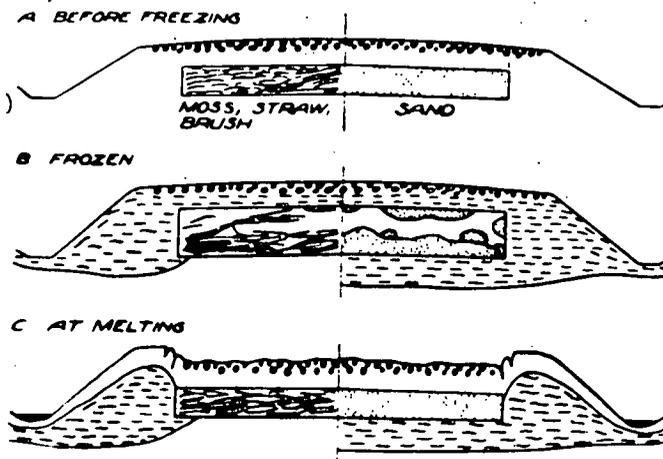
How Not to Construct Insulation Layer. (After Beskow)
